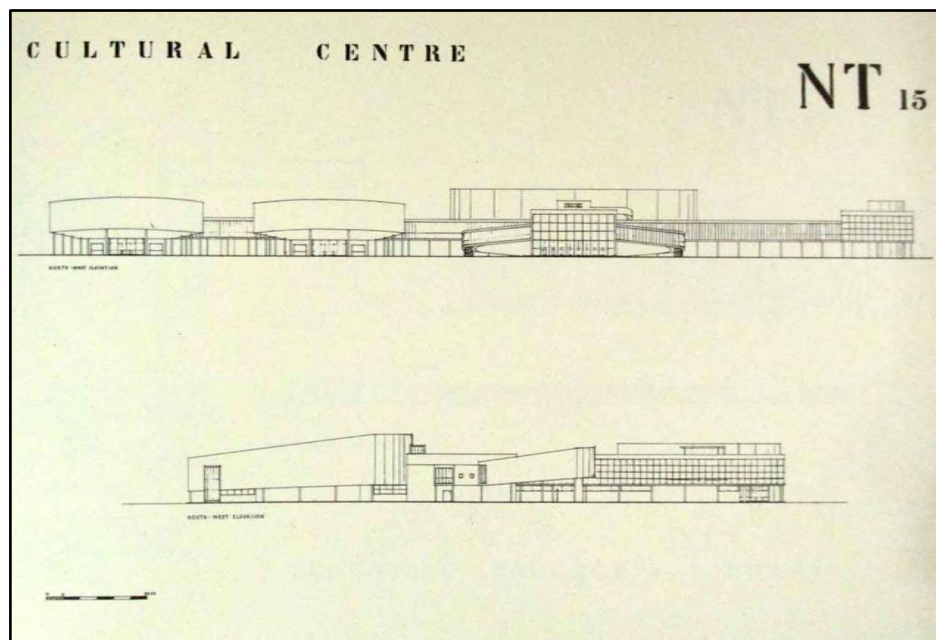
Elevations of the proposed town hall indicating the raised theatres.
